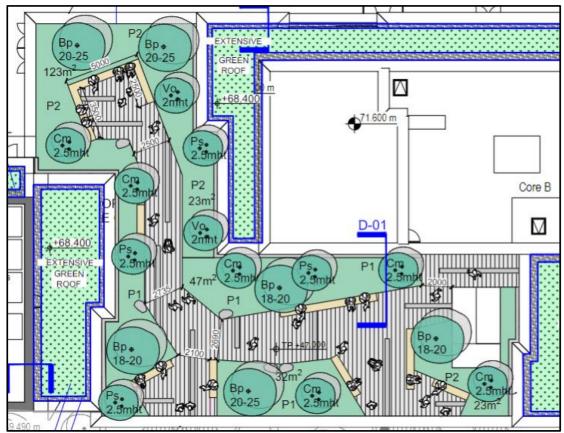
Landscape Plan of the External Amenity Space on Second Floor Level
